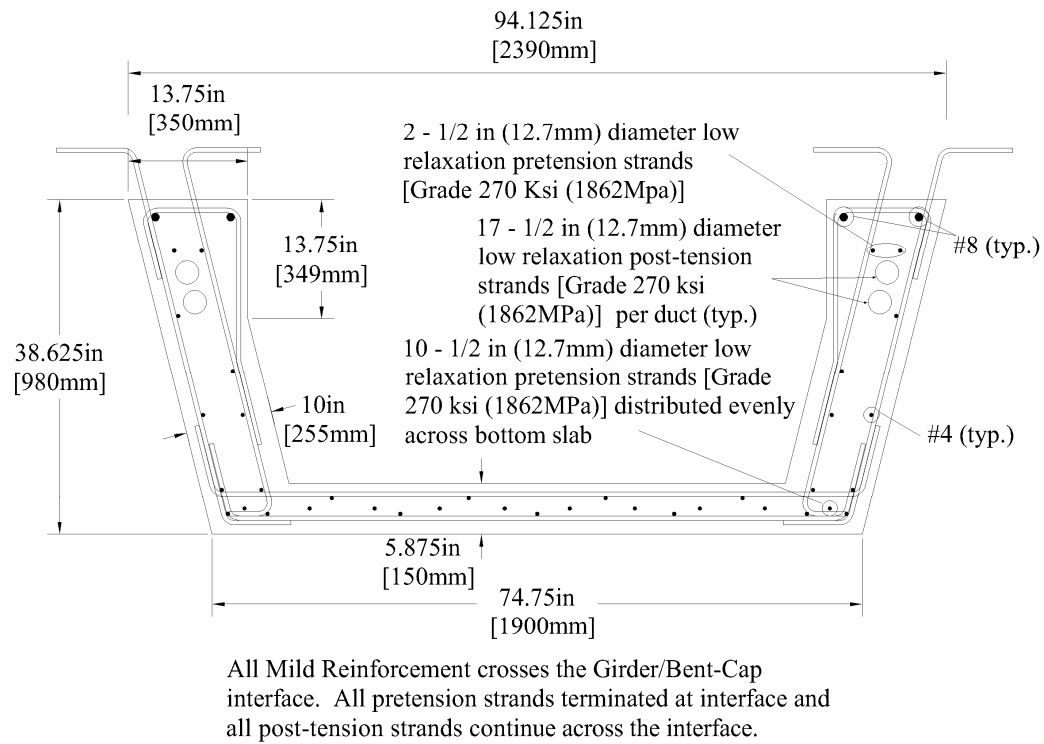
NDOT Prototype U-Girder Cross-Section at Girder/Bent-cap Interface
